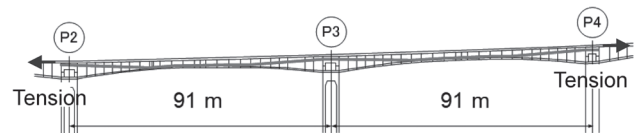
Arrangement of cable subject to measurement (external cables from Pier 2 to Pier 4)
